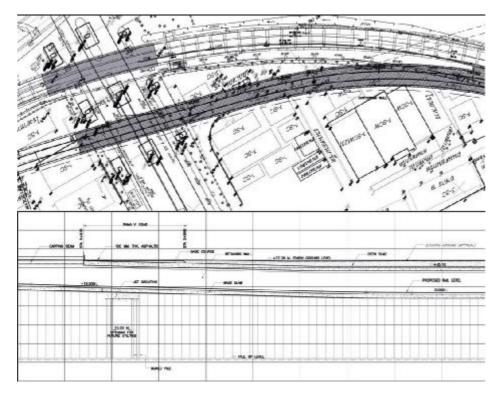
Plan and Profile of the Railway in vicinity of Rama VI road and Department of Highway
